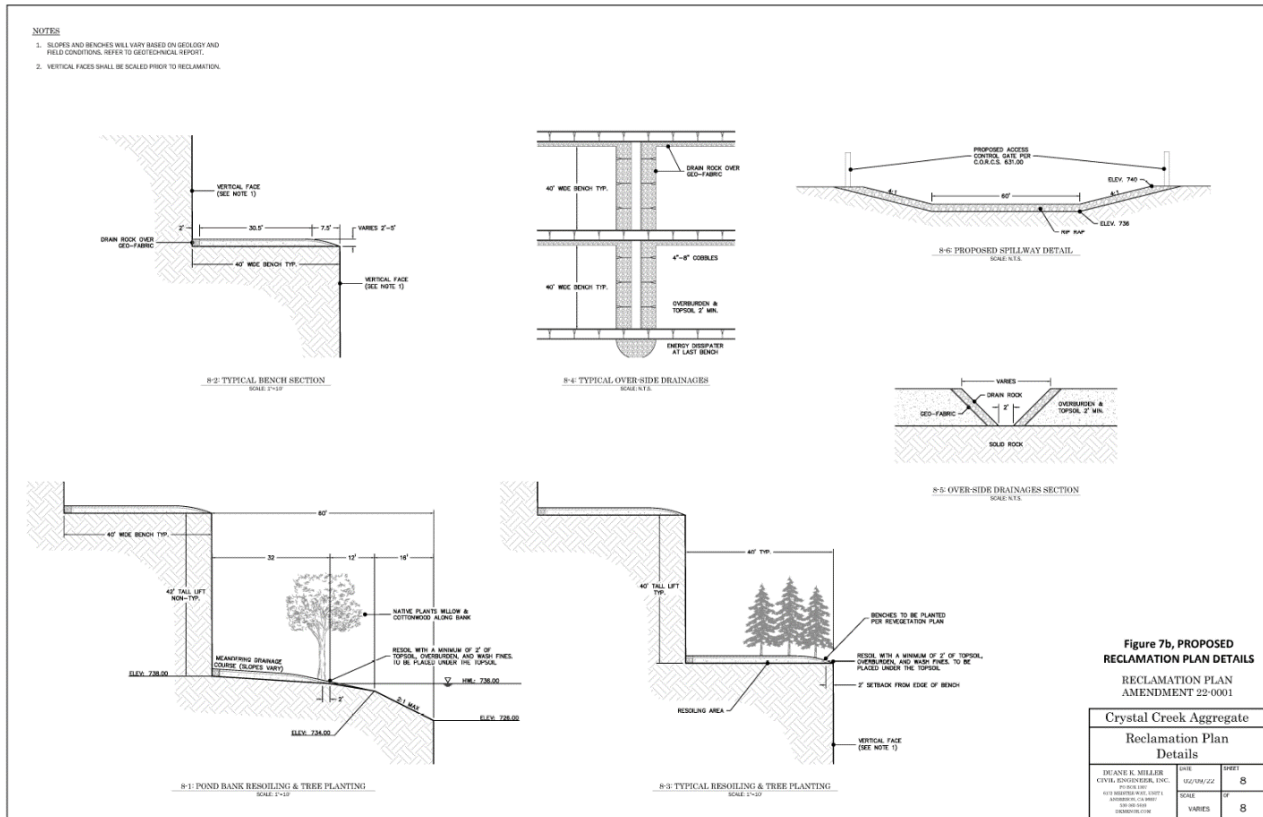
, PROPOSED RECLAMATION PLAN DETAILS
